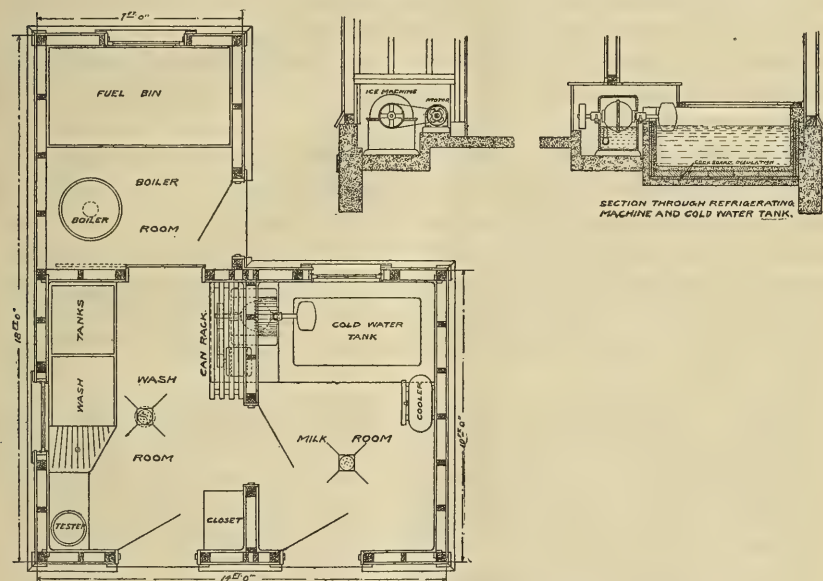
20-cow farm milk house equipped with refrigerating machine.
